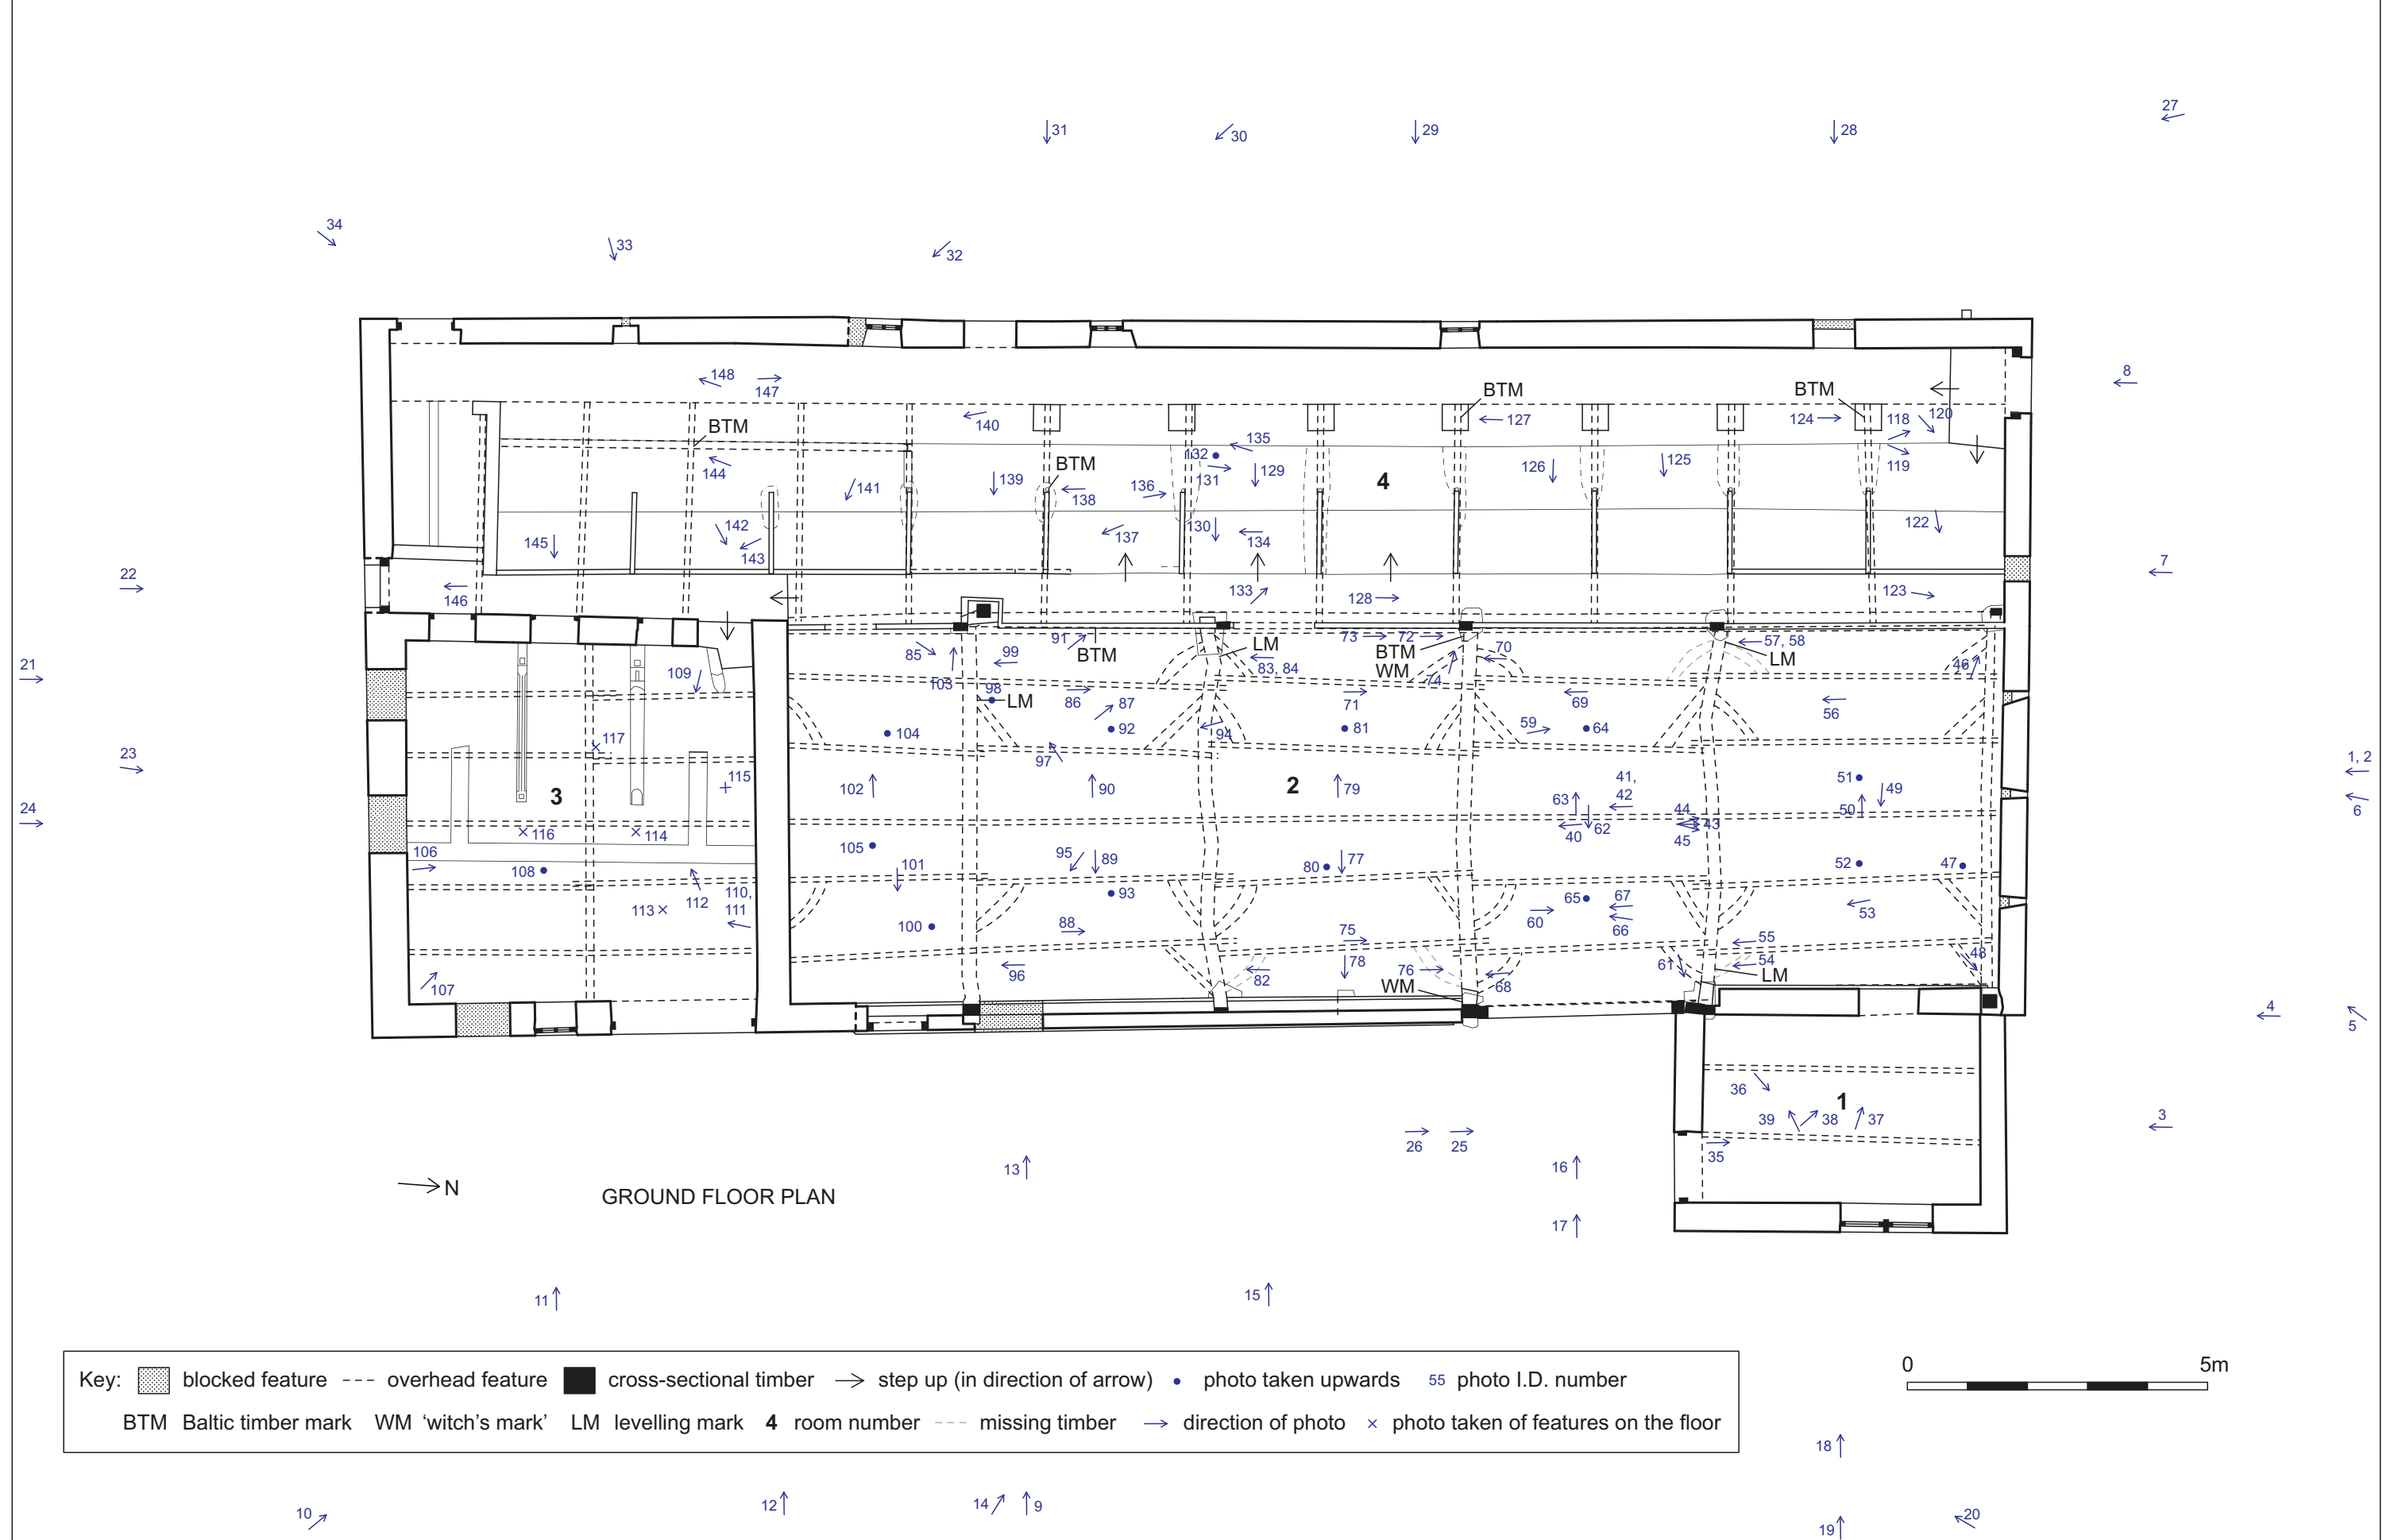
Ground floor plan, showing the location and direction of photographs taken of the building
